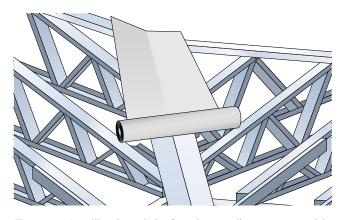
Installing the underlay from the top valley, note approach is from a fully battened section of roof
